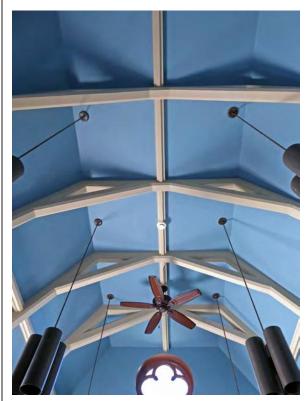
Vaulted ceiling with painted wood framing in Room 204.
